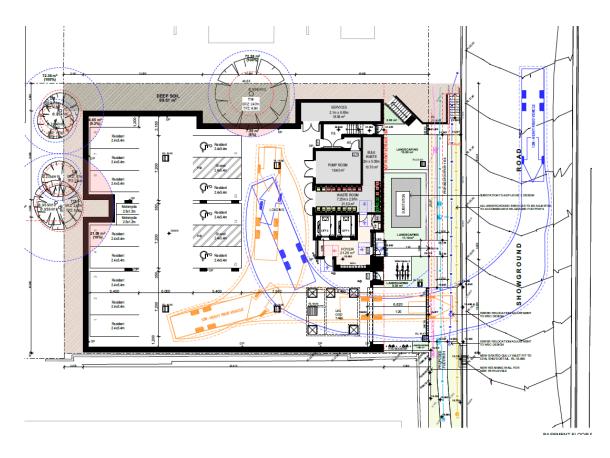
Basement Floor Plan. Source DTA [Revision A] dated 26.02.2025
